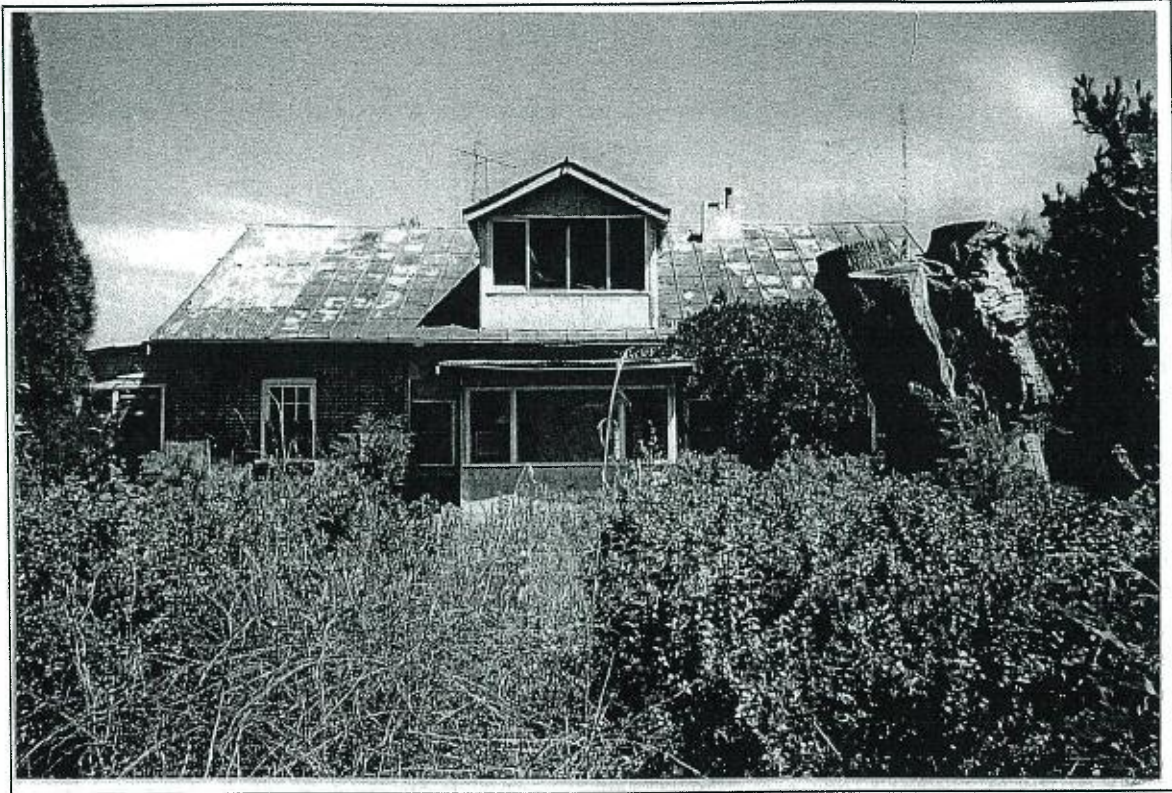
View of south elevation of Vine Lodge with original roof form and verandah removed and new lean to addition concealing entry
